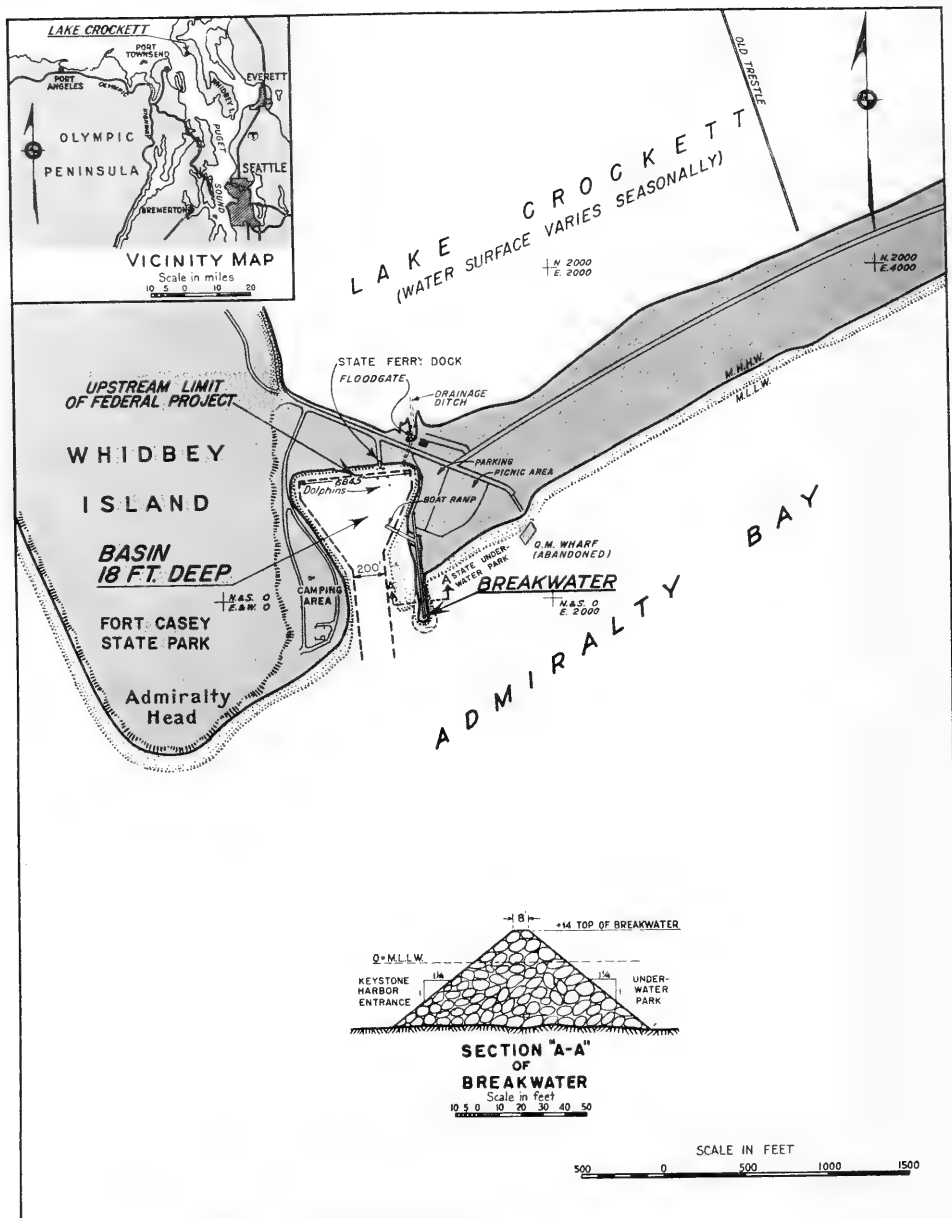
Site layout at Lake Crockett, Washington (revised 1979)
